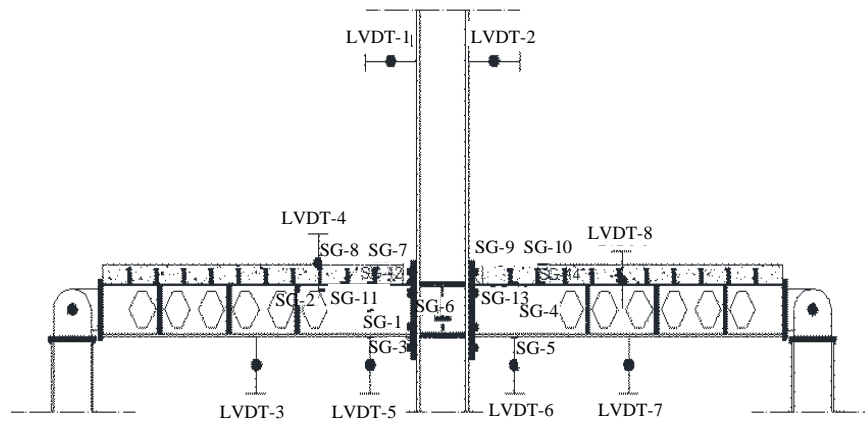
Strain gauges and LVDTs location for the first frame structure (composite castellated beam)
